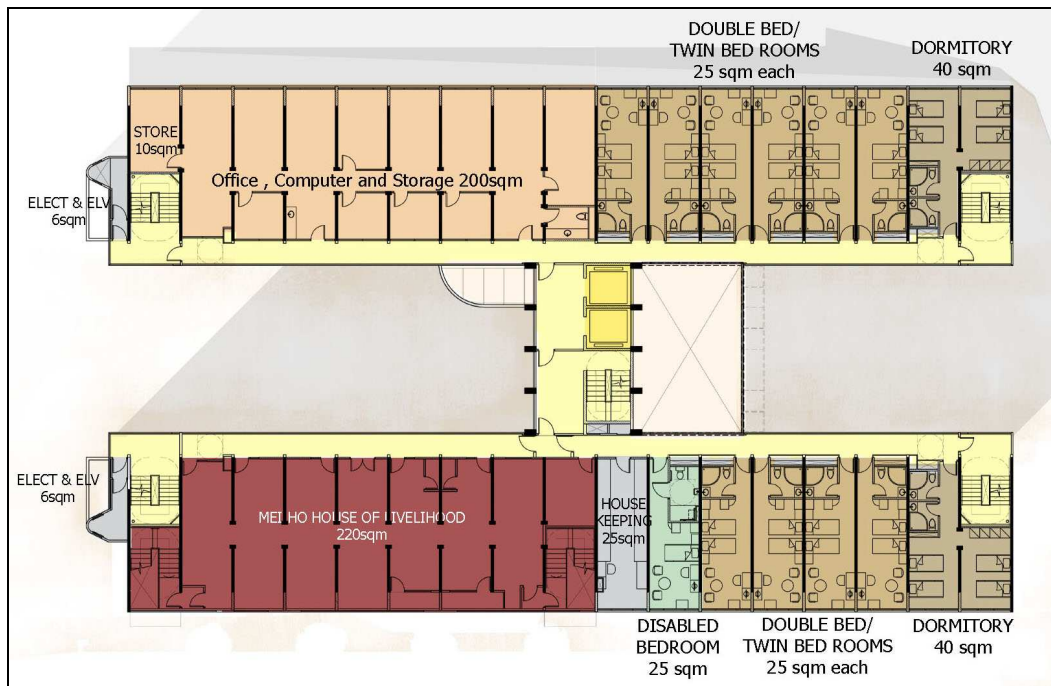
Ground floor plan, proposed layout for adaptive re-use scheme
